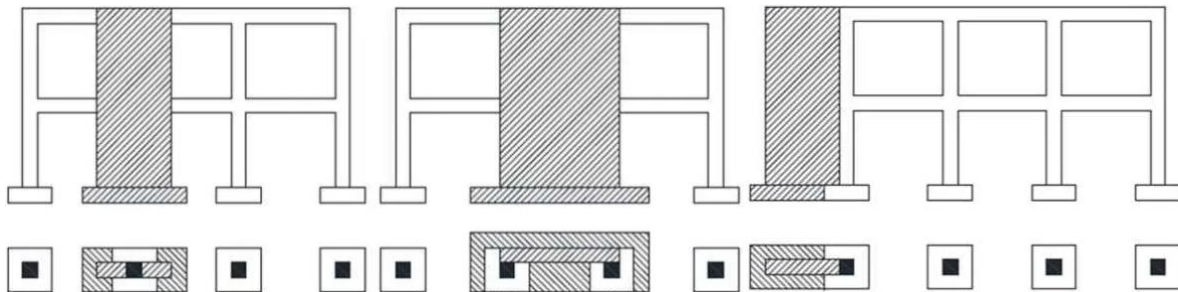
View and cross-section above the foundation of RC frames strengthened with new RC walls placed internally, externally, or as buttress [Tsionis et al. 2014]
